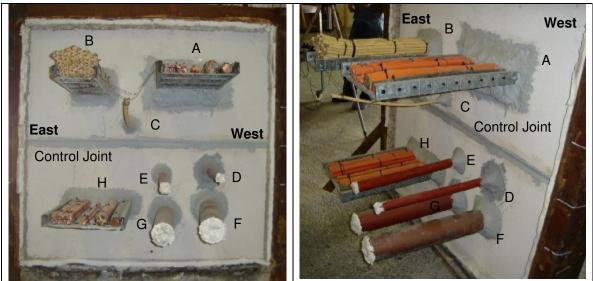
Exposed face of test specimen prior to commencement of the test.
